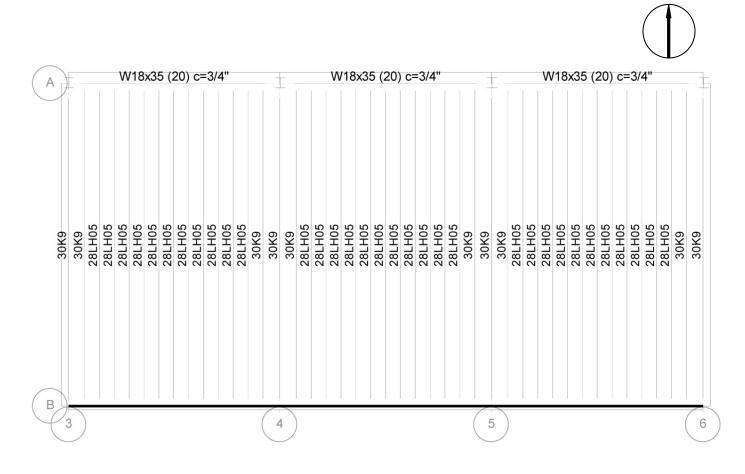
RAM design for open web steel joists with composite deck and shear wall.
